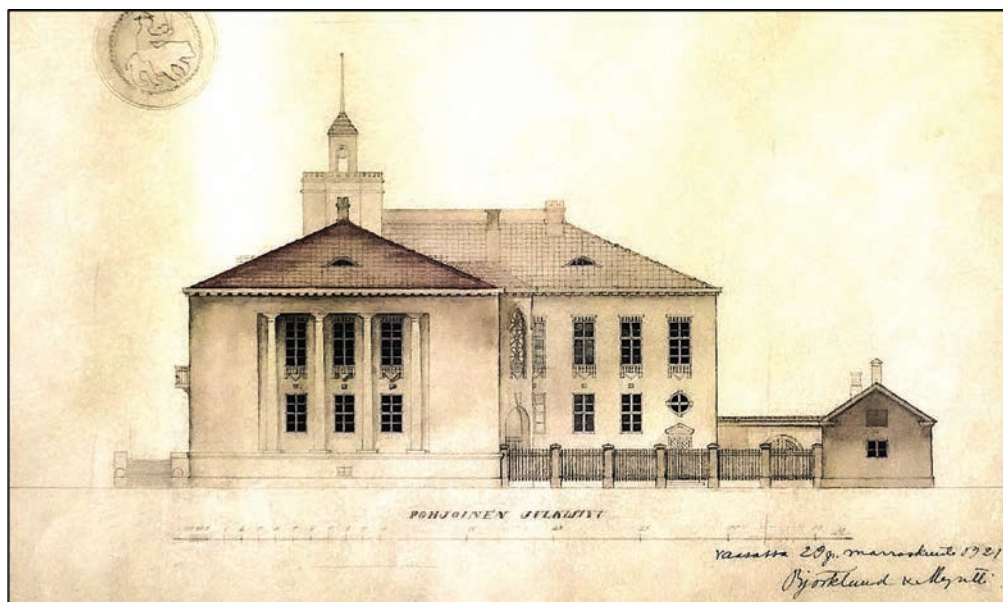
Lapua Town hall. The Northern façade. M. Björklund & Myntti, Vaasa 1921. The original hanging in Lapua Town hall. Photo by the author.
